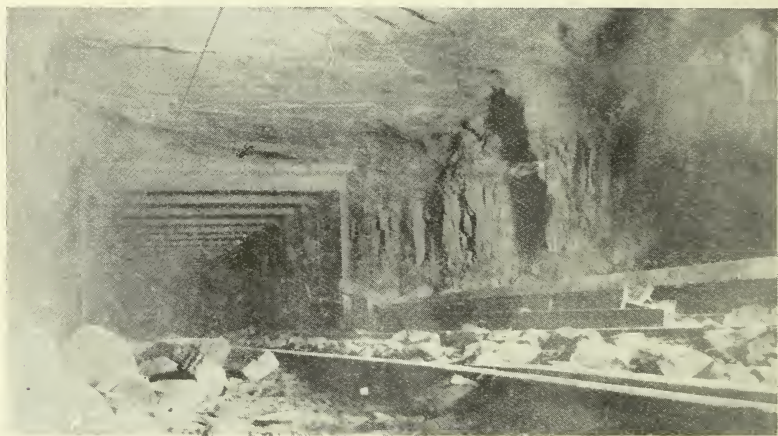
ROADWAY IN COLLIERY COATED WITH 'GUNITE' TO PREVENT FALLS.
